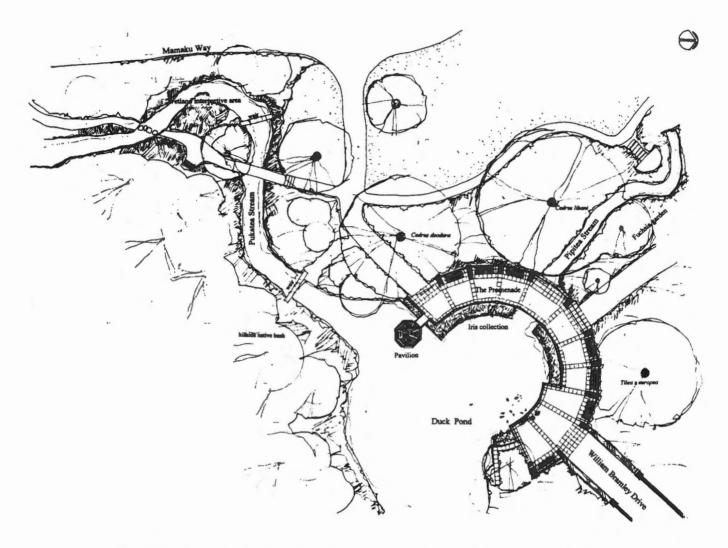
Plan showing redeveloped Duck Pond complete with formal promenade and Pavilion
